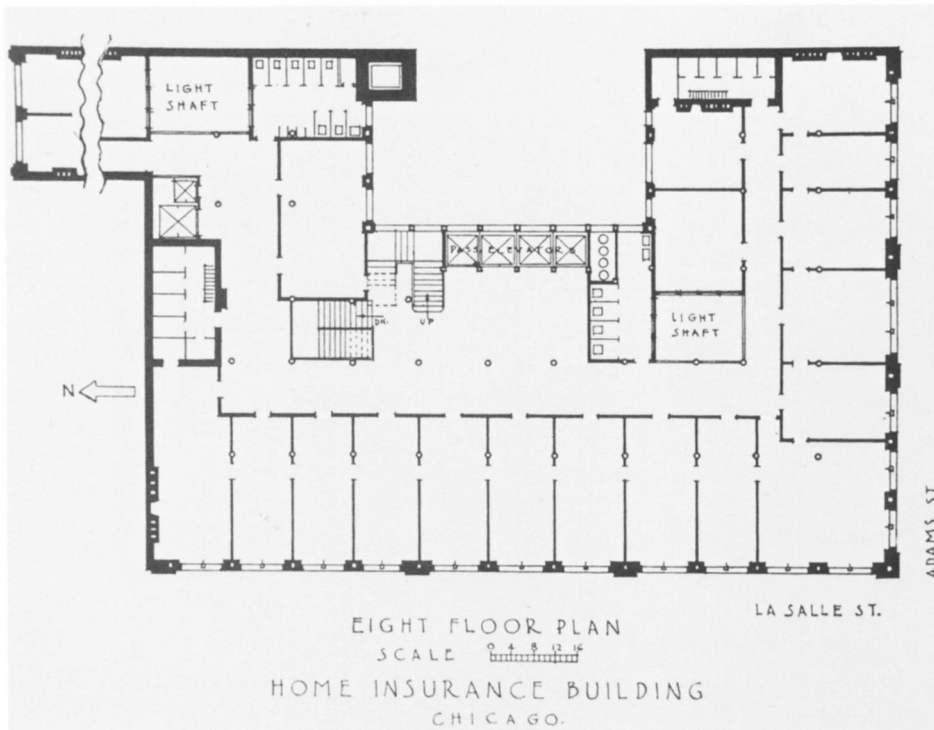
Jenney, Home Insurance Building, typical floor plan. (Tallmadge, *The Origin of the Skyscraper*; Art Institute Chicago).
